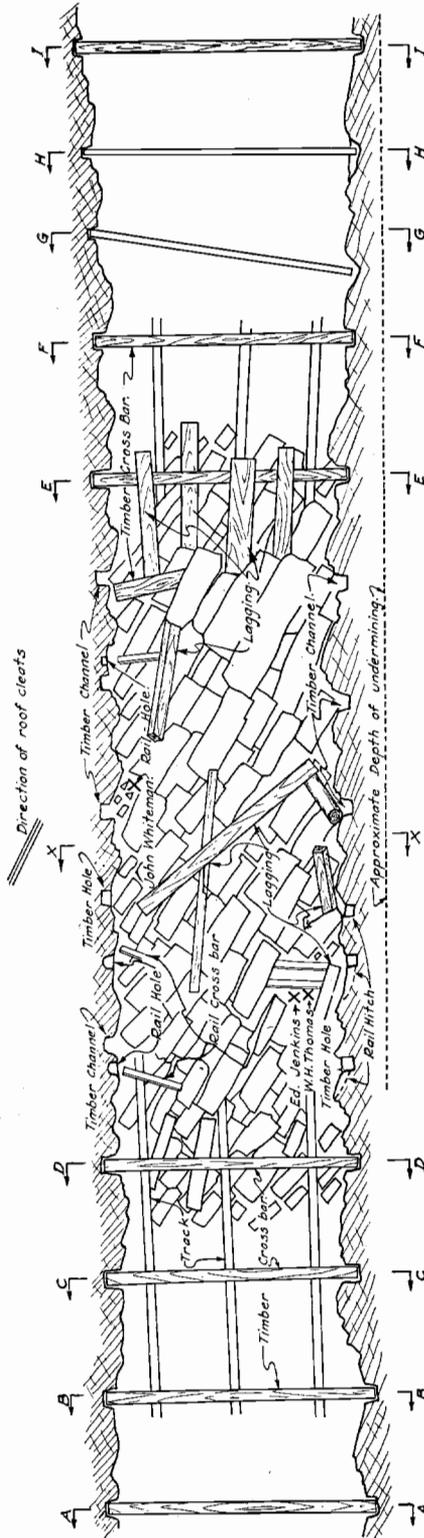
Sketch showing details of roof fall accident - Bowers Furnace Mine.
